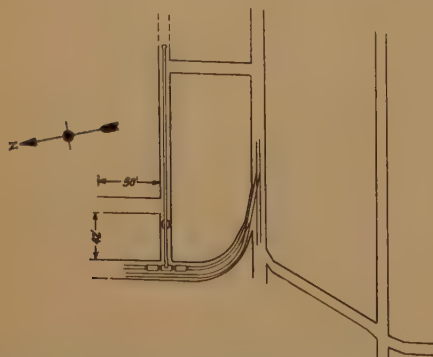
SHAKING CONVEYOR DRIVE FROM UPPER NORTH ENTRY.
